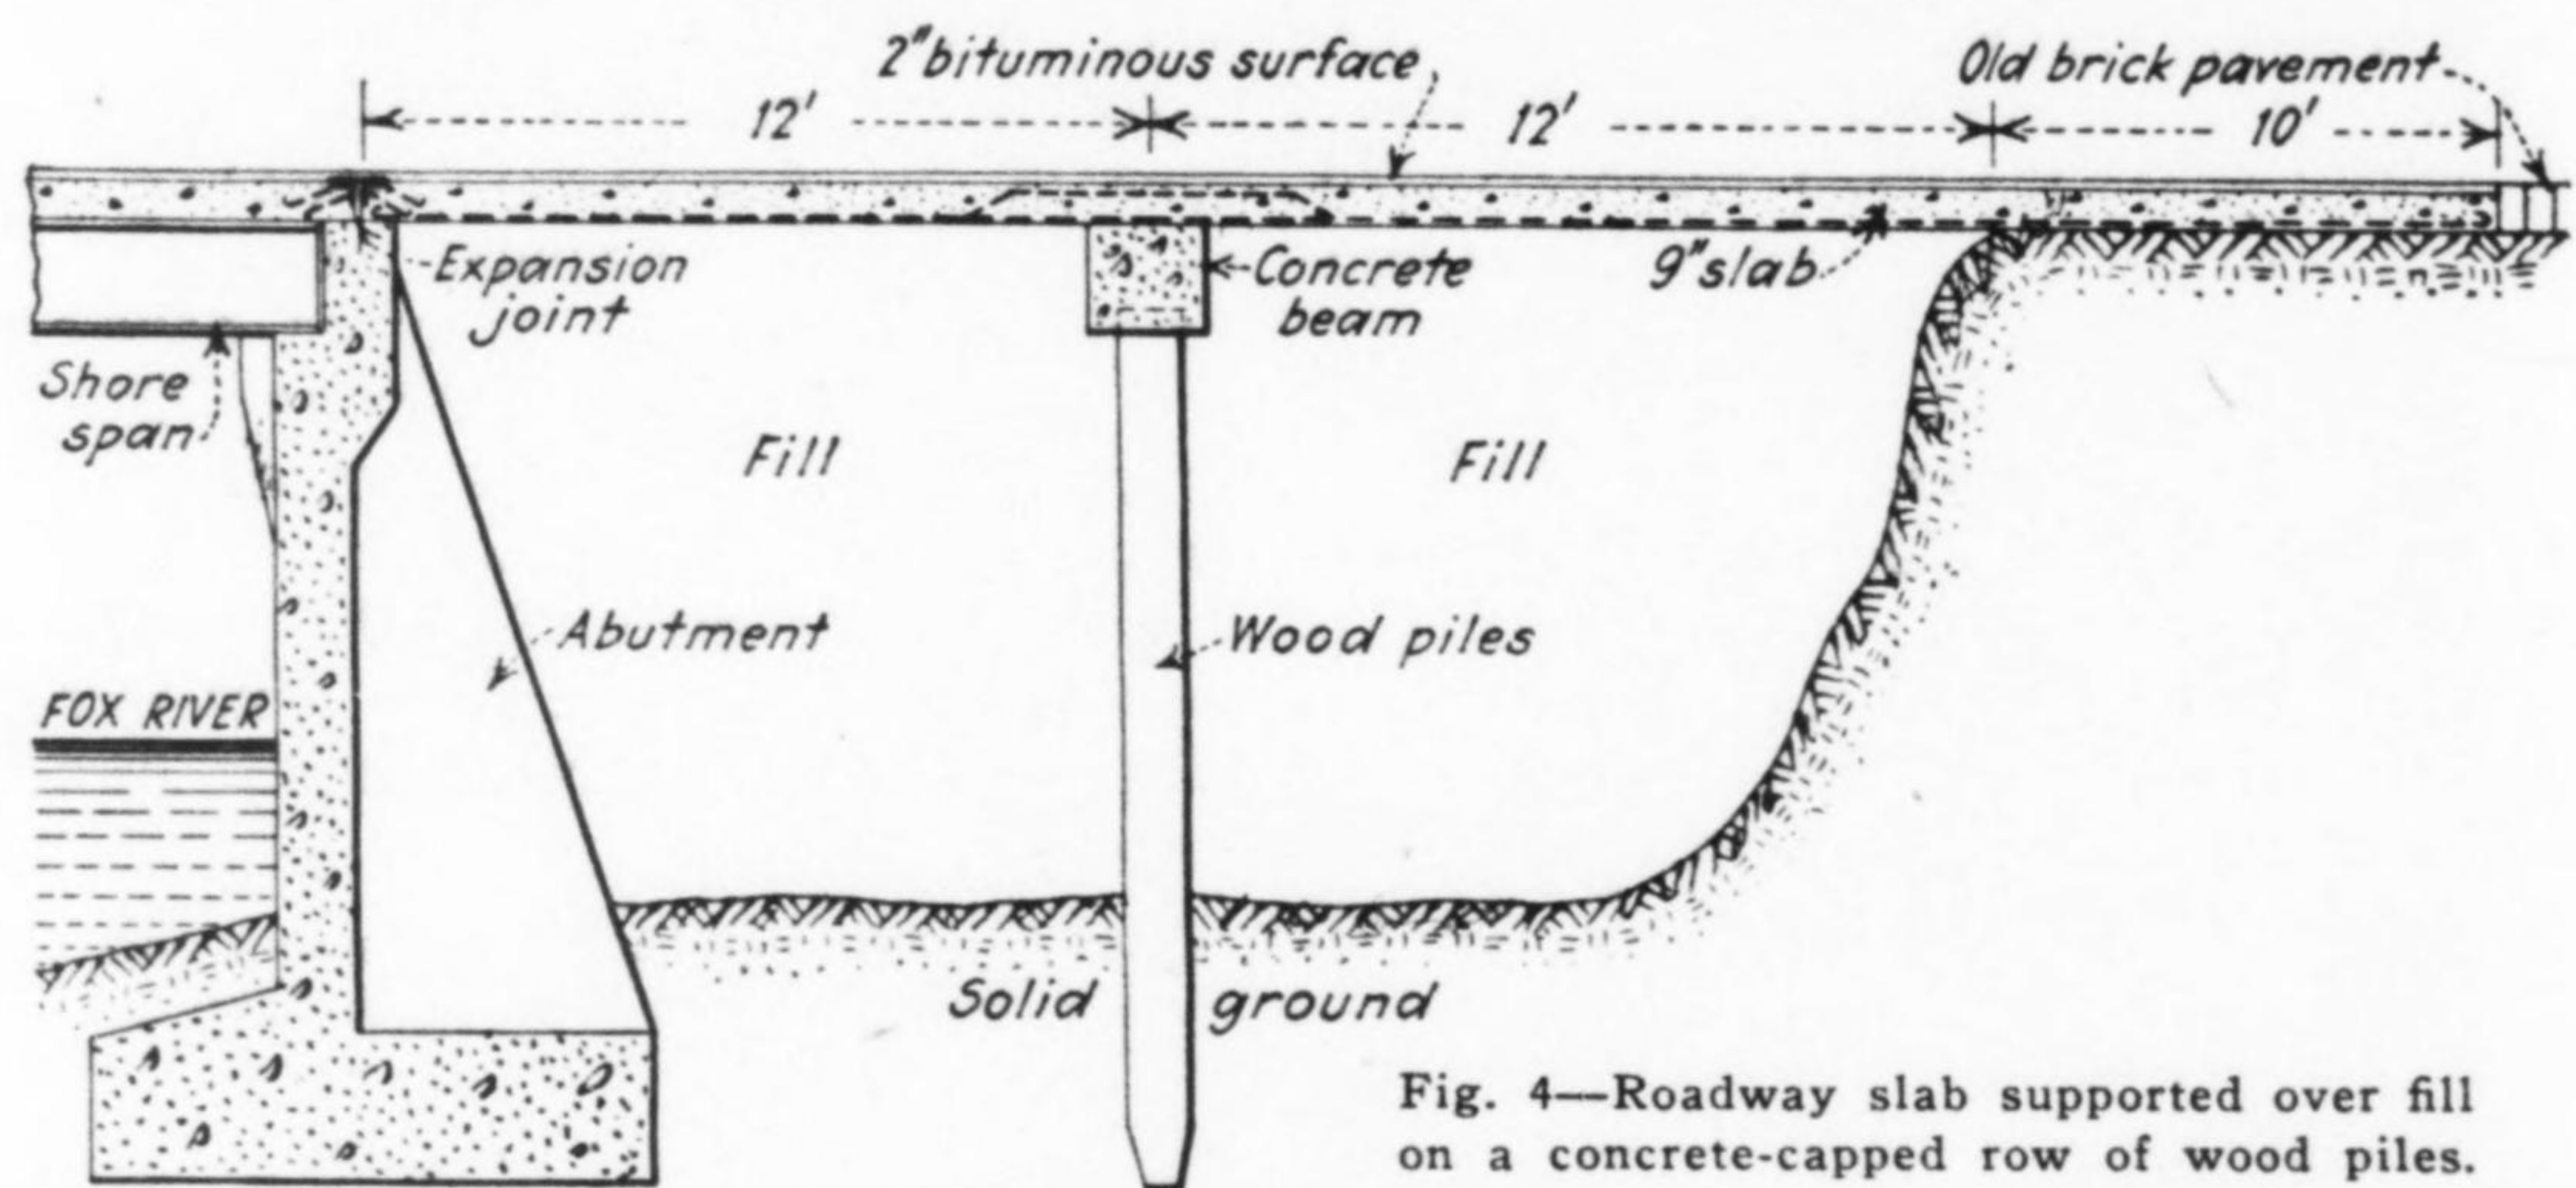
Roadway slab supported over fill on a concrete-capped row of wood piles.
